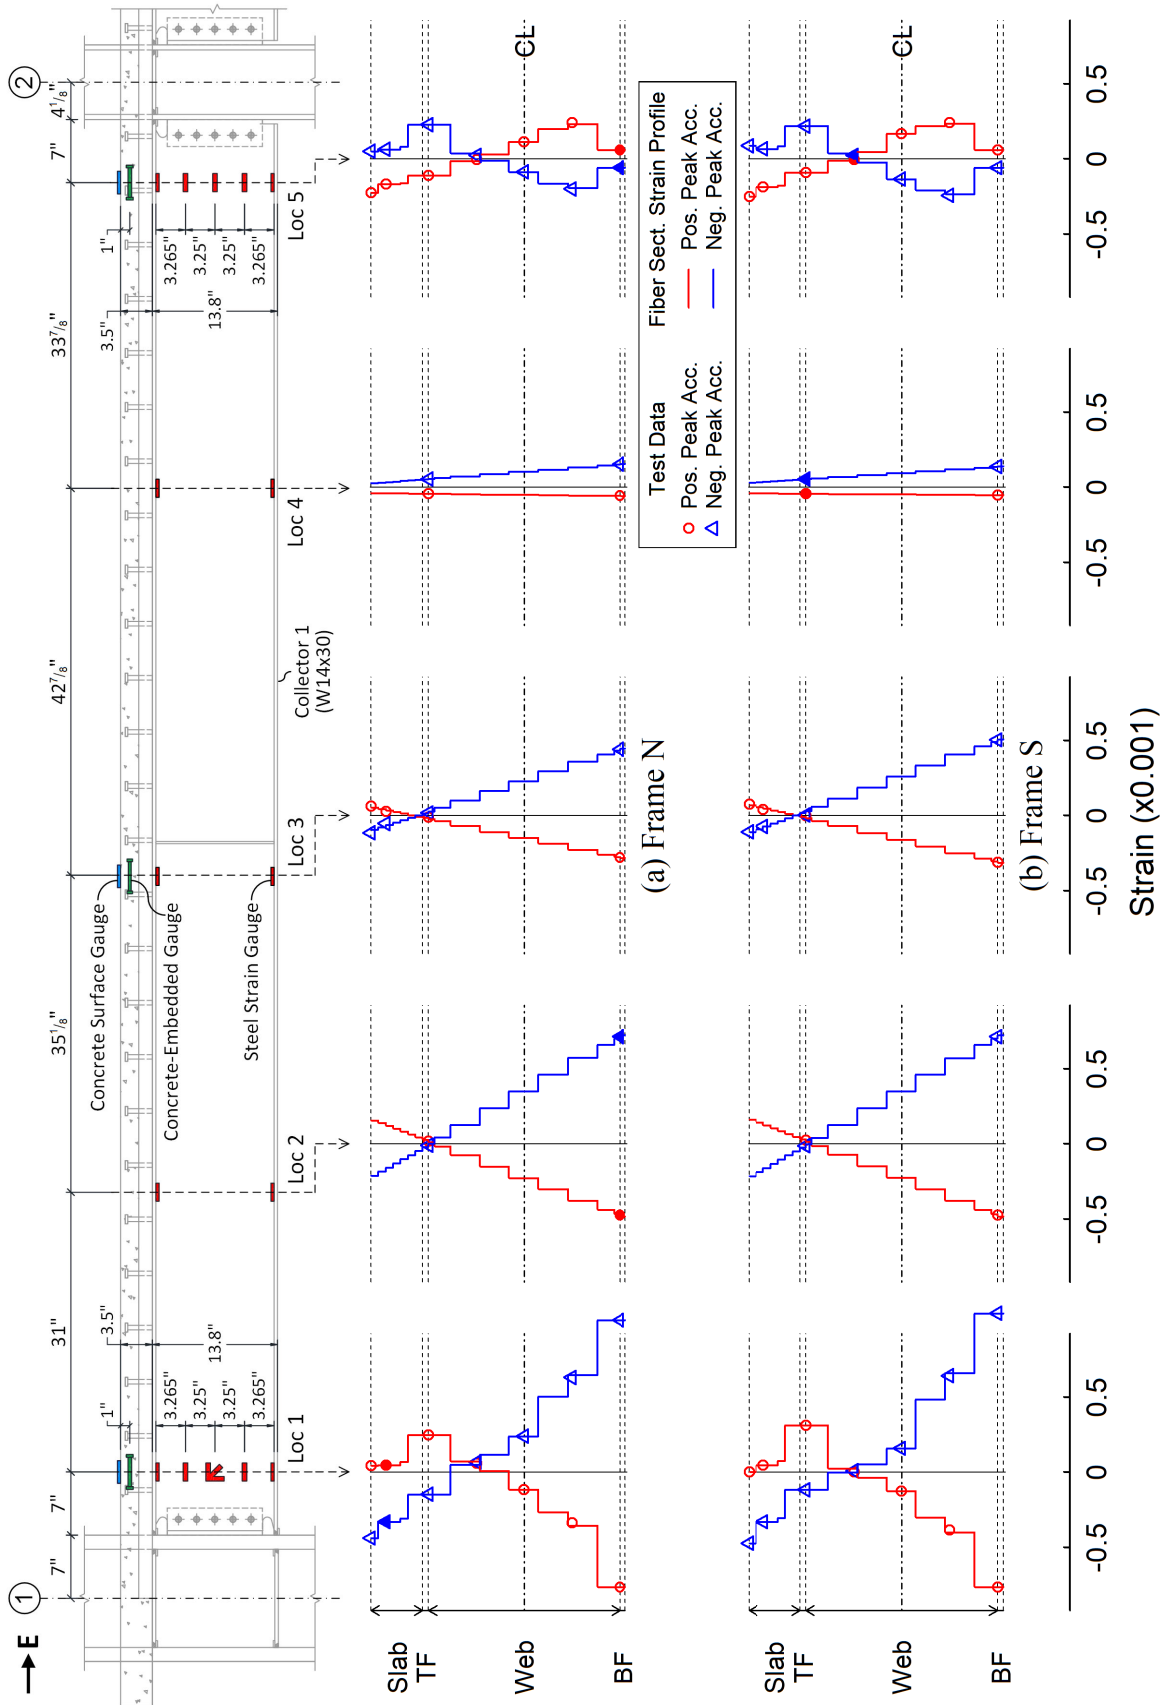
Test 1-3: Fiber Section Strain Profiles of Collector 1 (2<sup>nd</sup> Floor)
